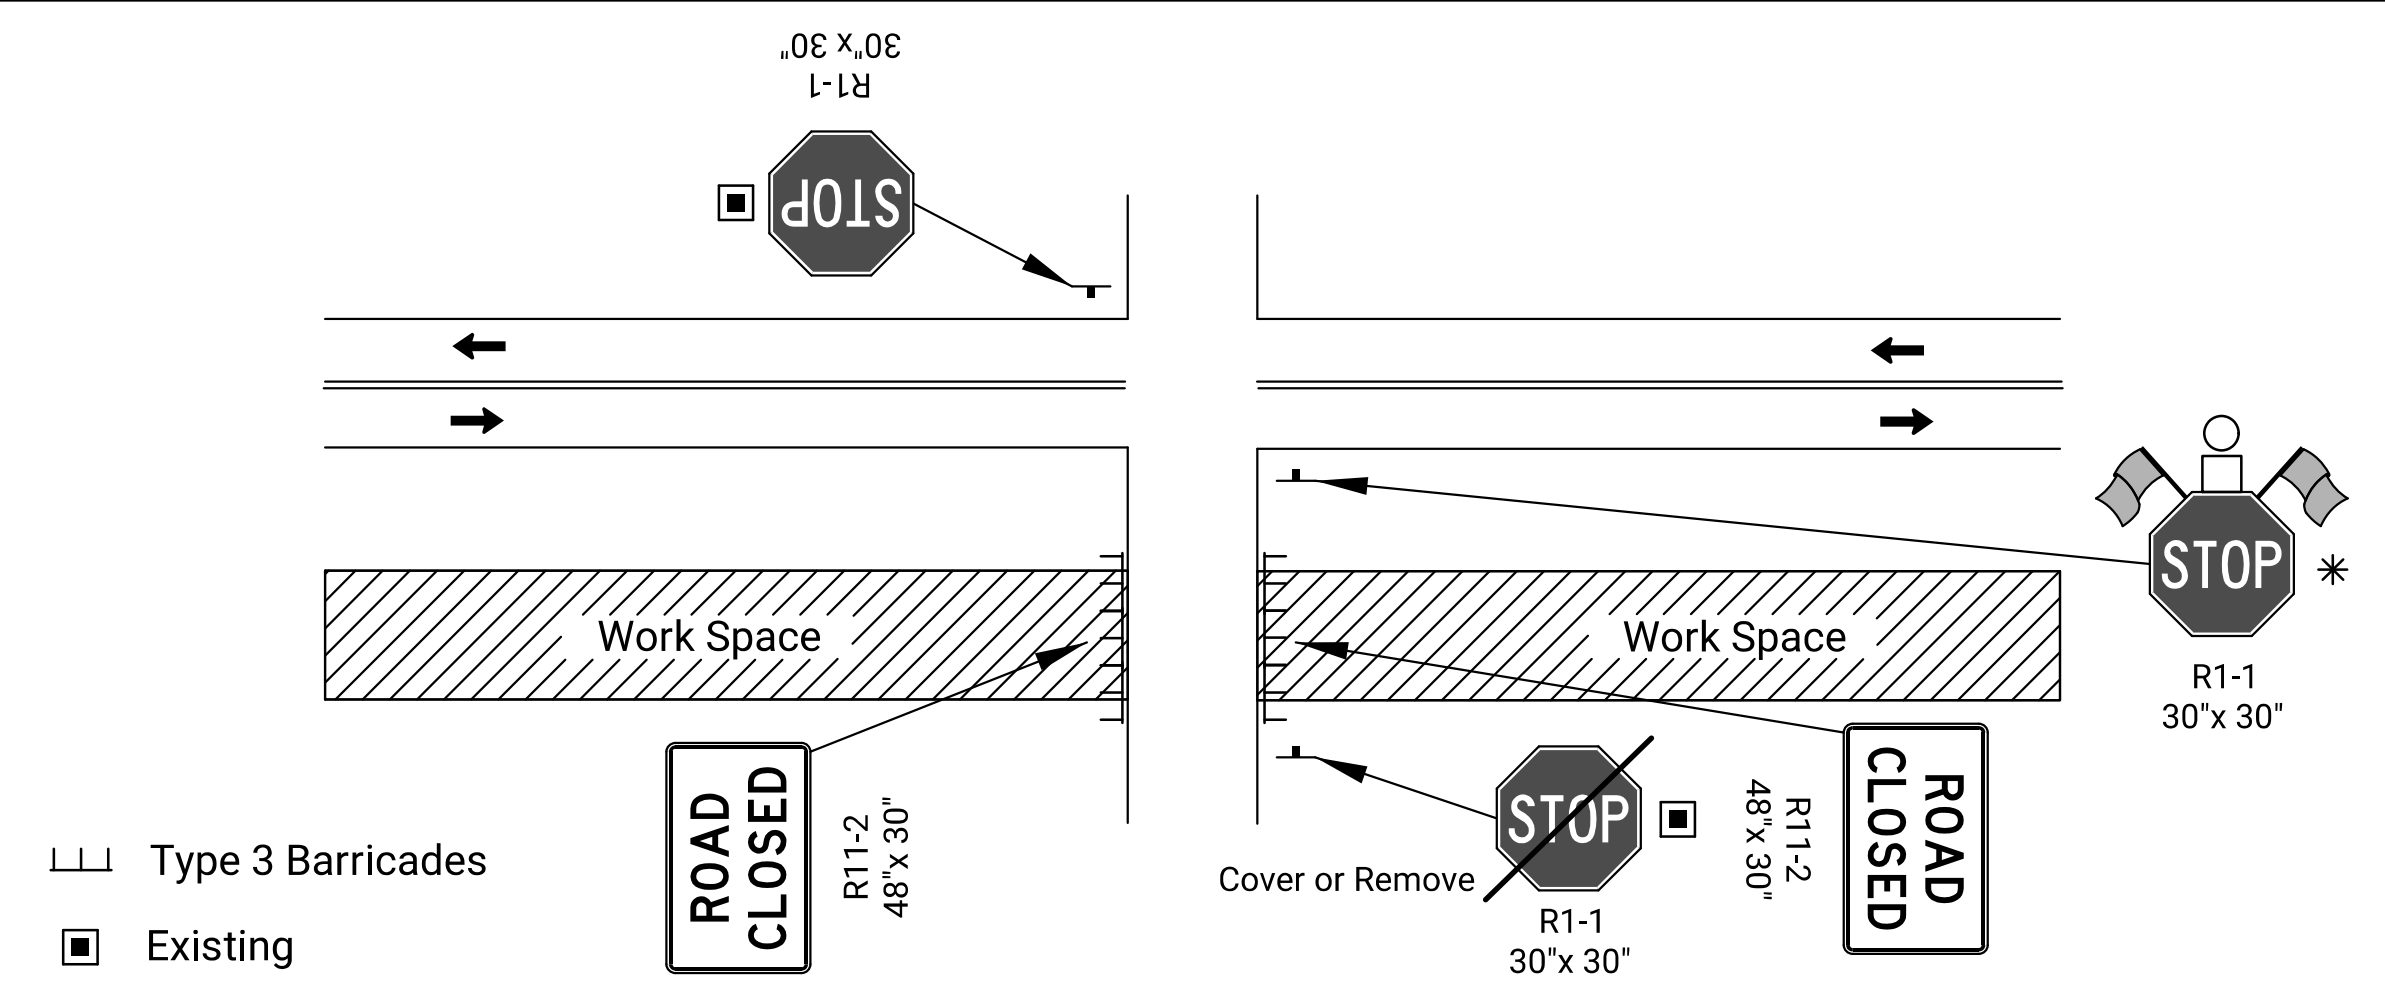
SIDE ROAD OPEN THROUGH WORK AREA ON DIVIDED ROADWAY
